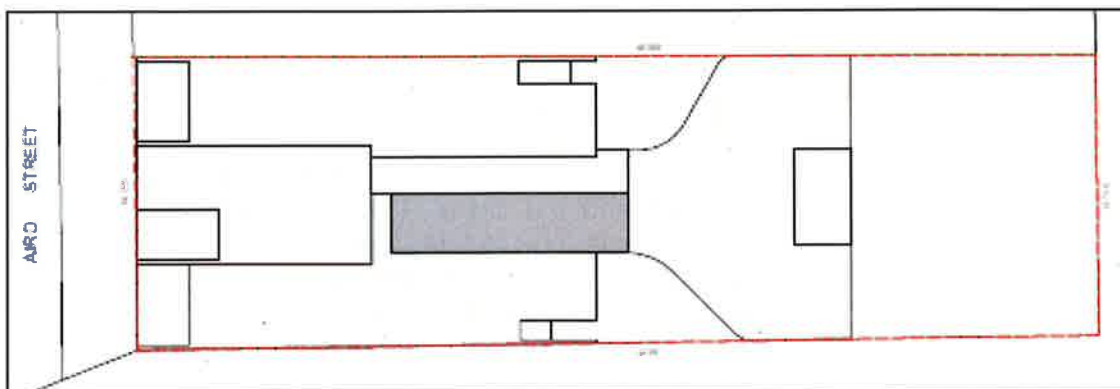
Typical floor plan (Source: Applicant's Urban Design Report)
